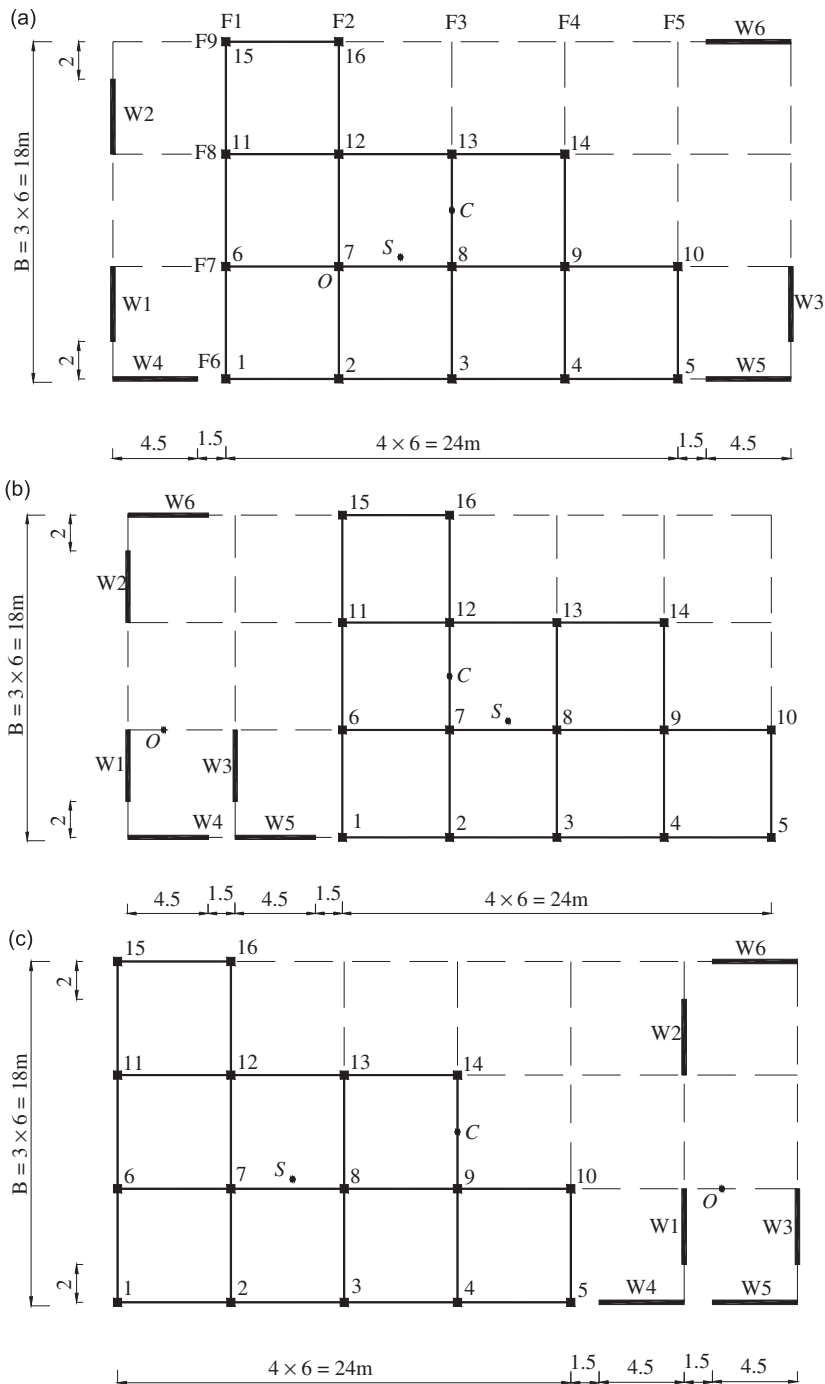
(a) Floor Plan 1, (b) Floor Plan 2, (c) Floor Plan 3; for the family of 10, 20, 40 and 60 storey wall–frame structures of the Examples section. All dimensions are in metres.
